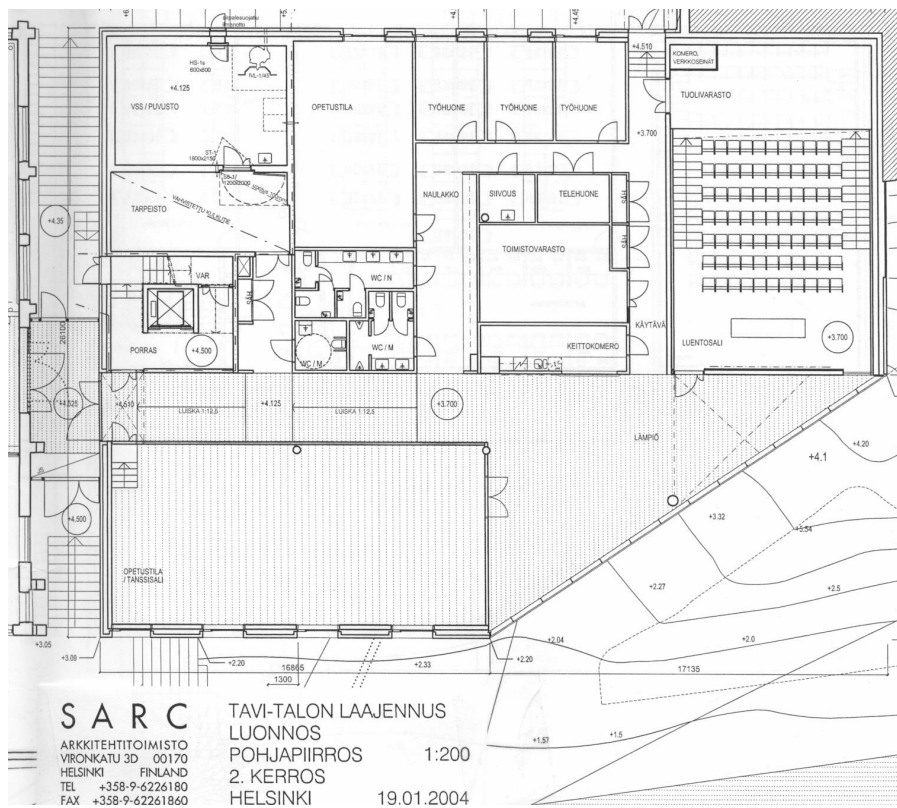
Floor plan of the Art and Media extension, Helsinki Polytechnic
